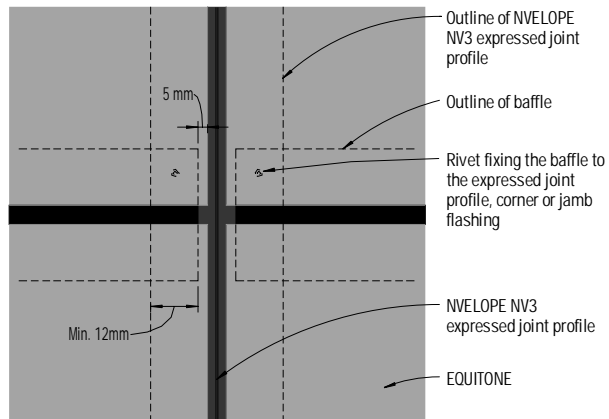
Baffled horizontal joint junction with vertical joint - Elevation
